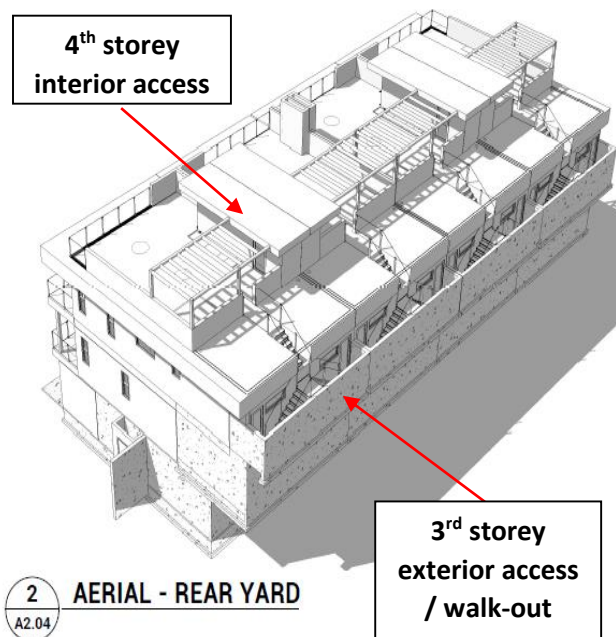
rooftop rendering of upper level building with internal and exterior stairs
